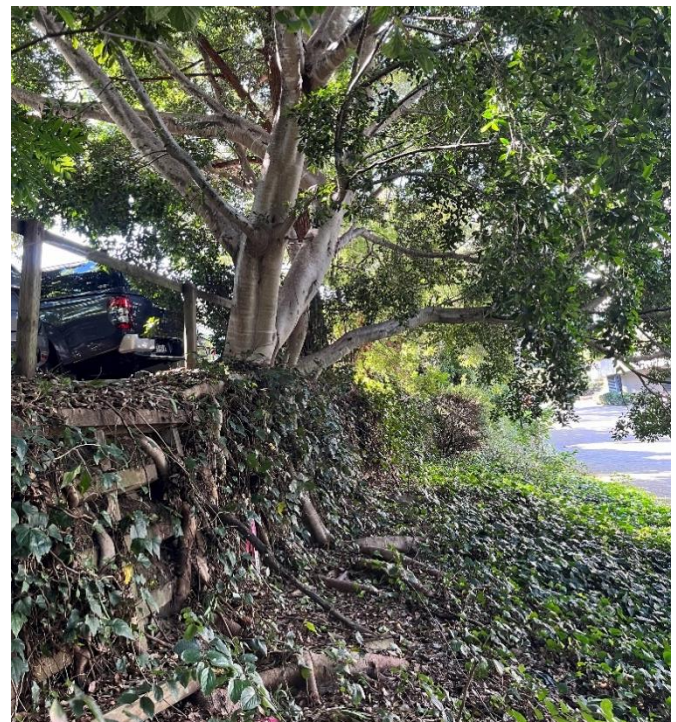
Structural roots and tree branches growing into the FPA site and area of approved works
